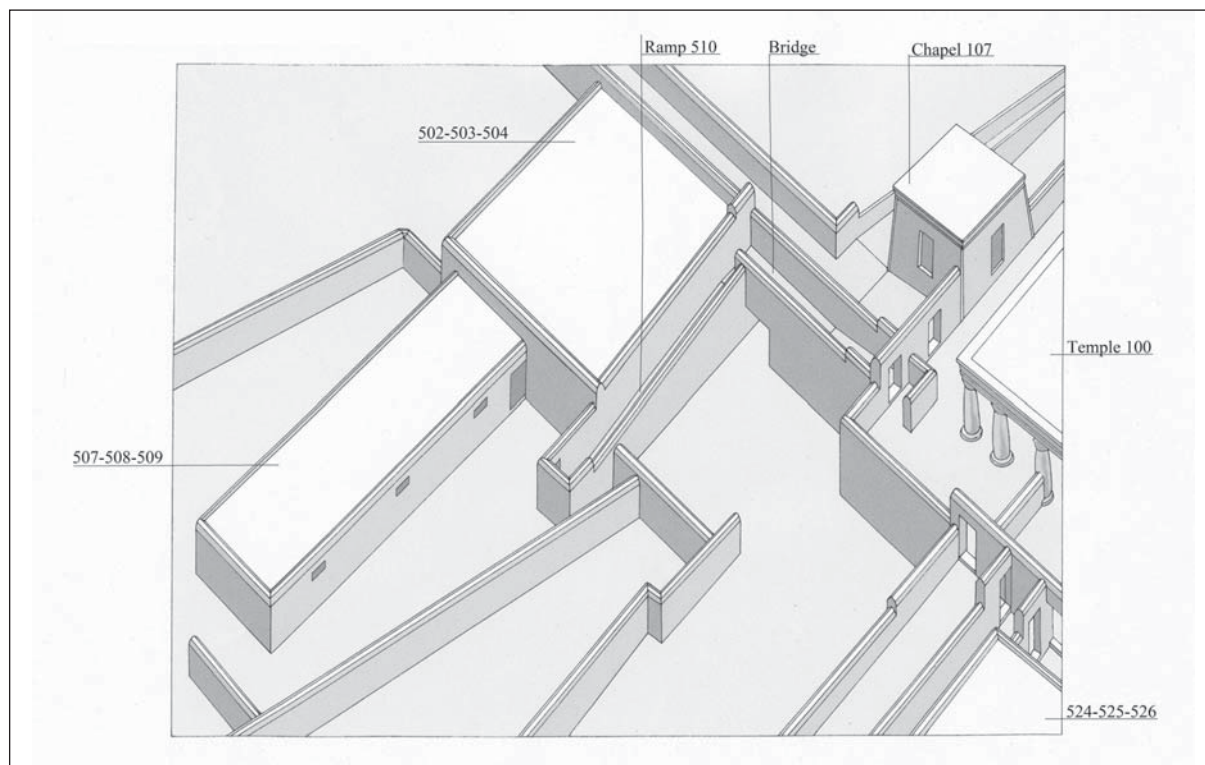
Bird's eye view of purification building and its special ramp and bridge up to the “Central Terrace” (cf. fig. 13). In the right hand lower corner is the roof of “apartment” 524-525-526. (Design: D. Eigner, drawing: I. Säuberlich).
